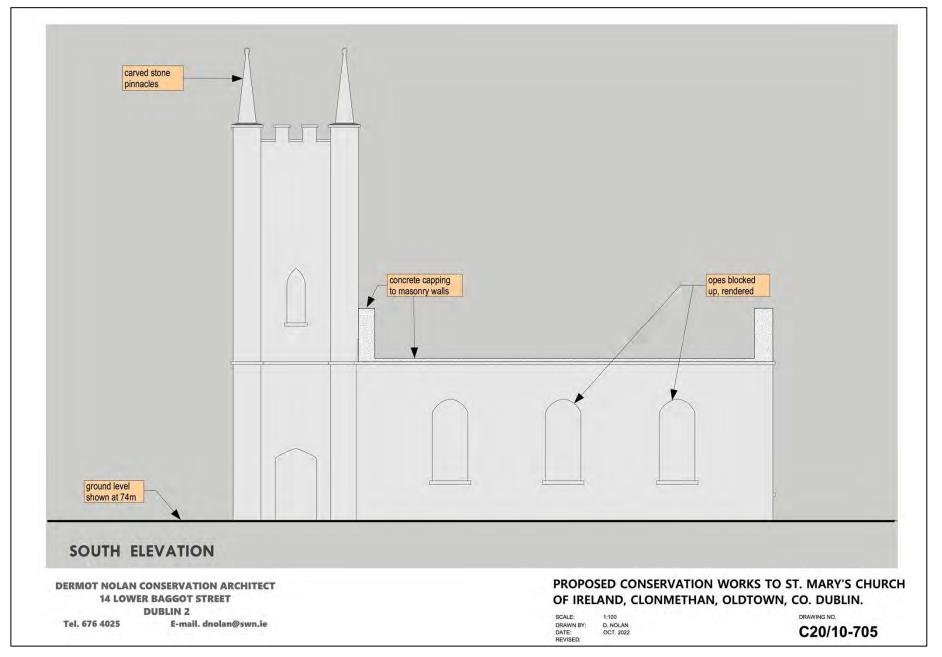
South elevation of St Mary's Church (Nolan 2022).
